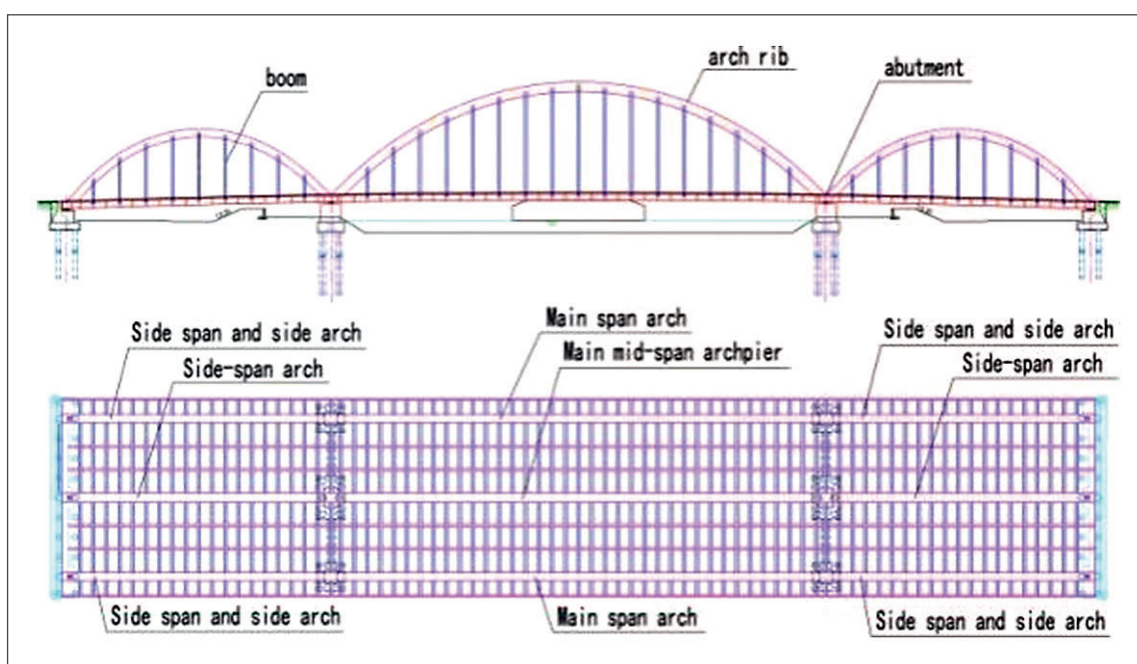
Three-arch, three-cable face side main girder rigid tie composite arch bridge structure
